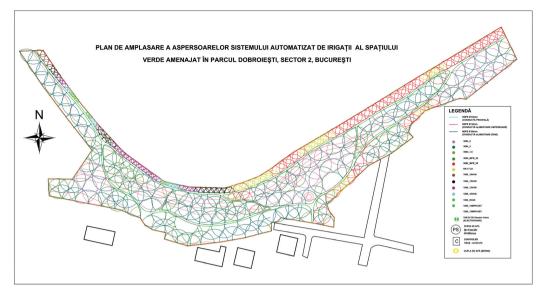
Angle range and location plan design of sprinklers of the Dobroiești irrigation system
